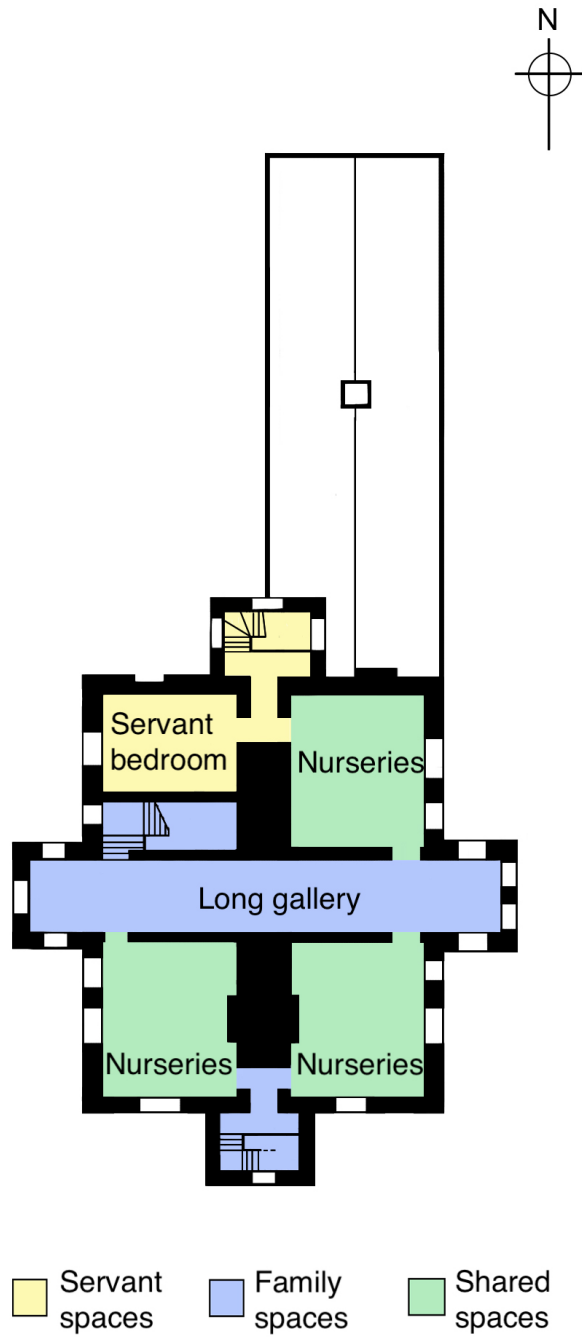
Kiplin Hall c1740 Phase 1 second floor plan
